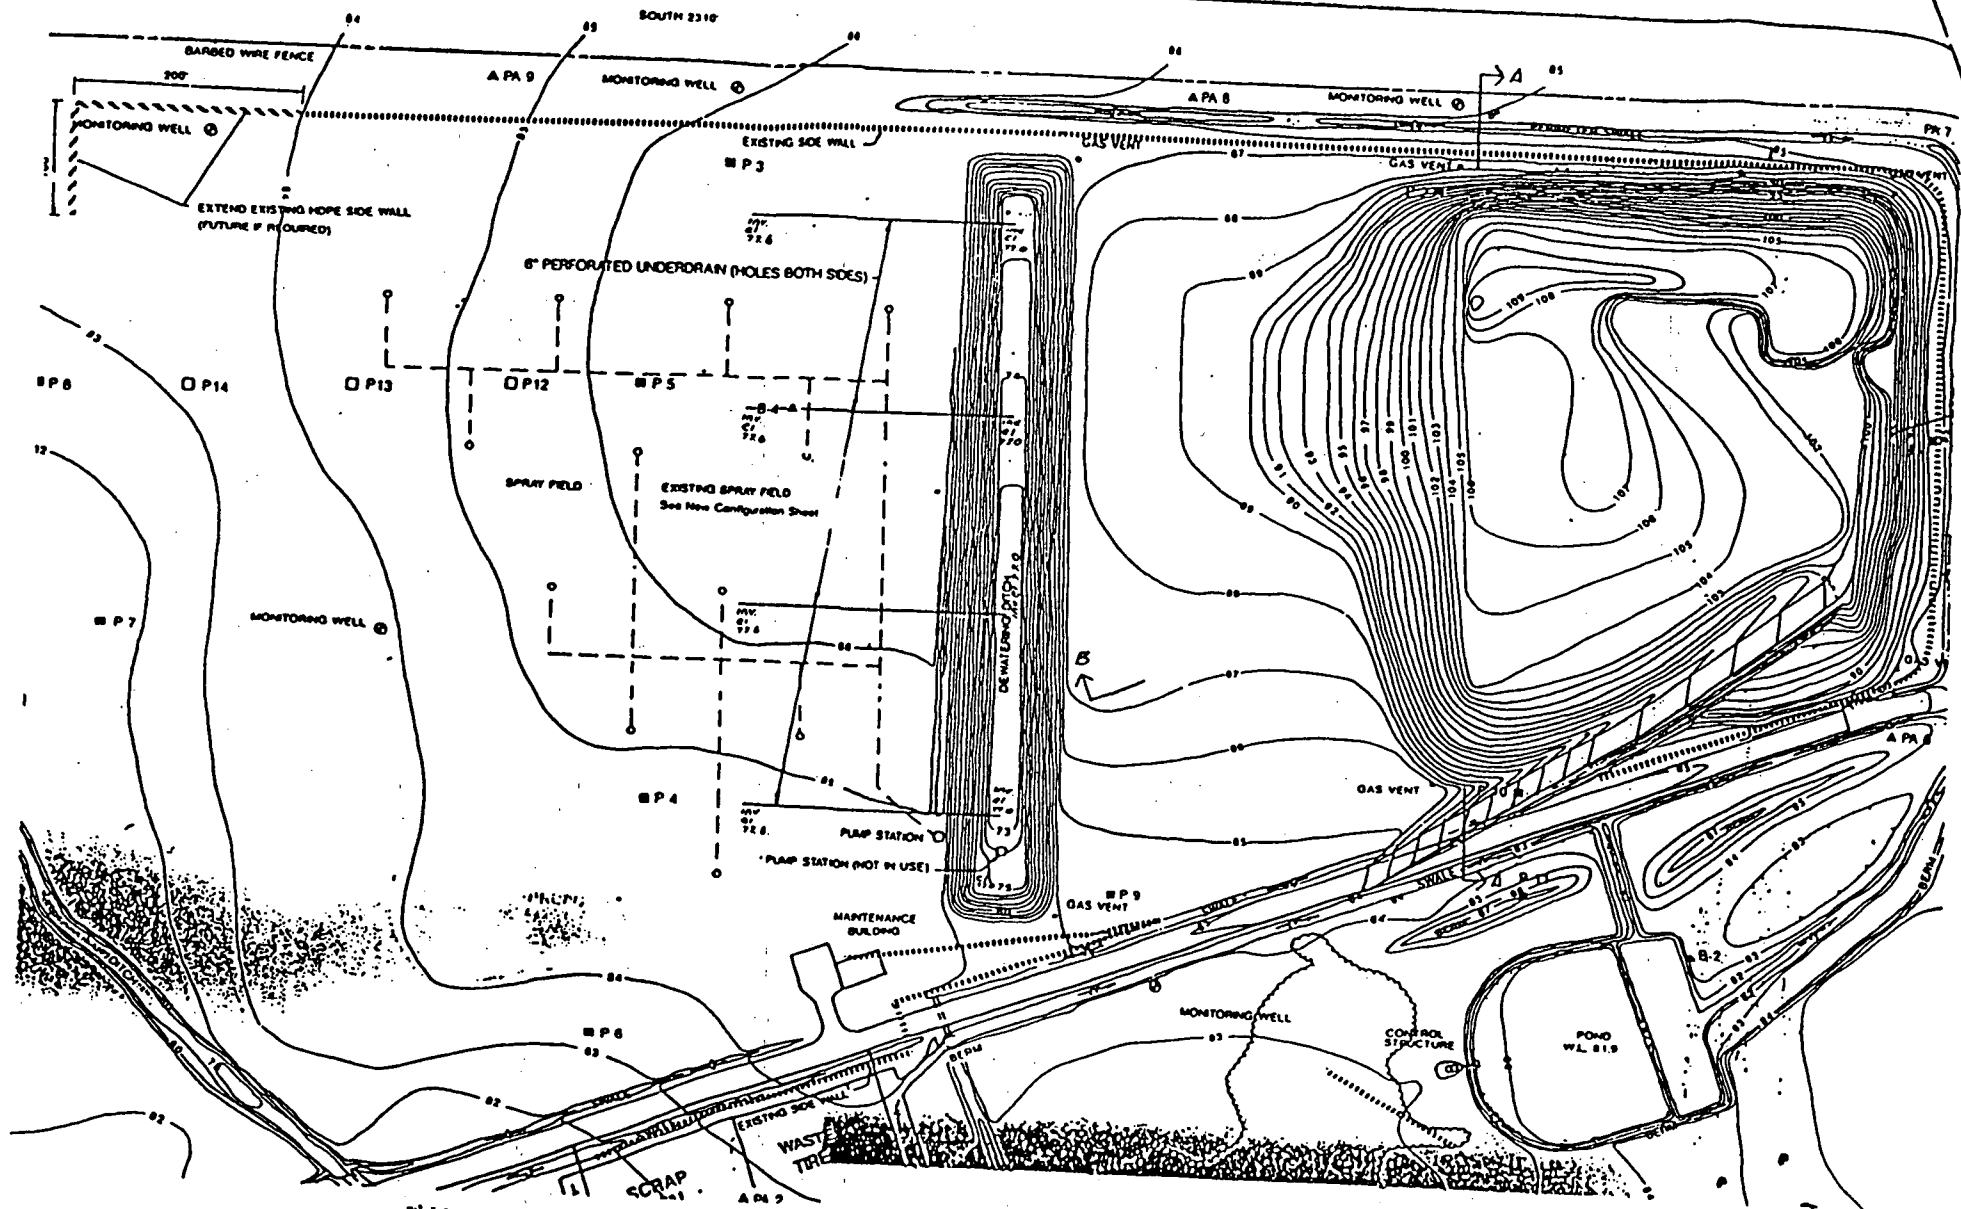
Improvement Site Plan (per 8/2/93 Wade-Trim Sheet 4/6)
